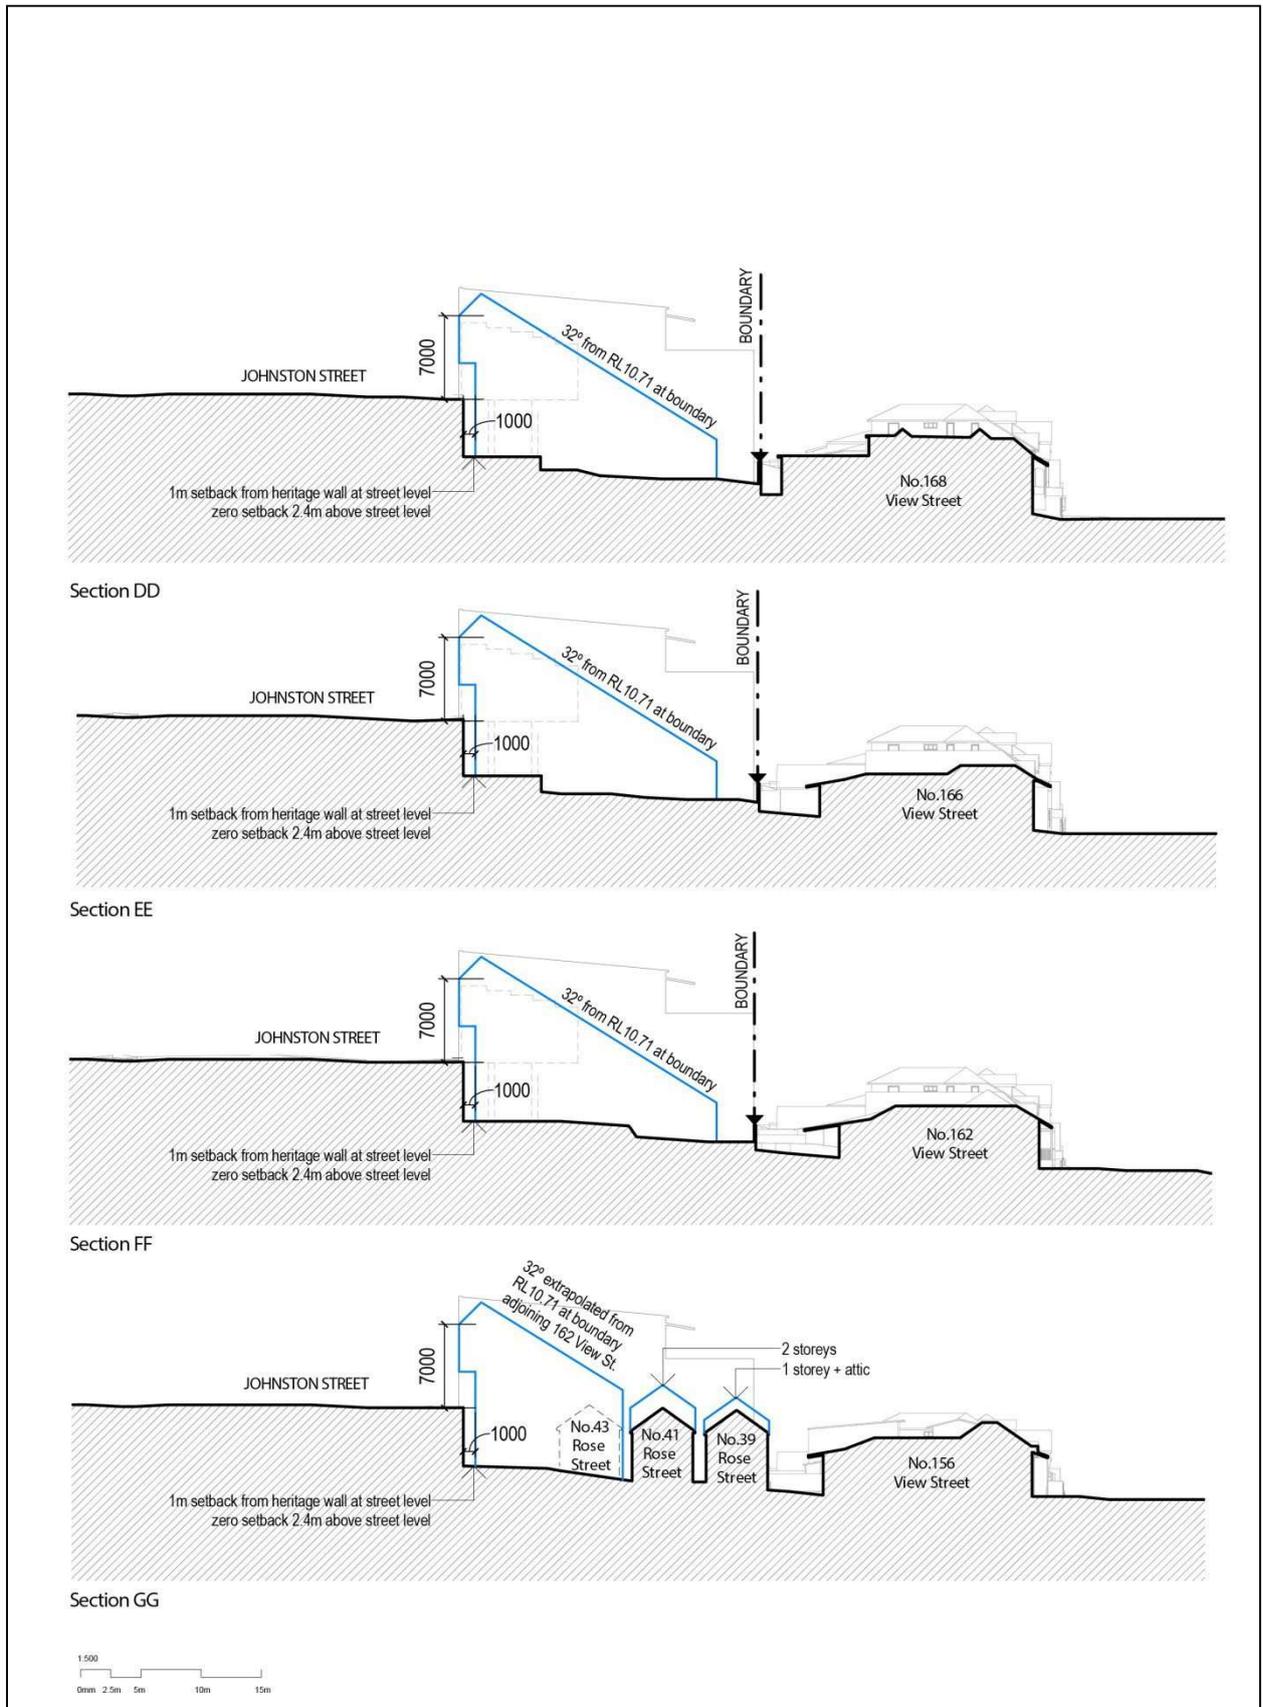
Building Height and Massing Envelope – Section DD, Section EE, Section FF and Section GG
